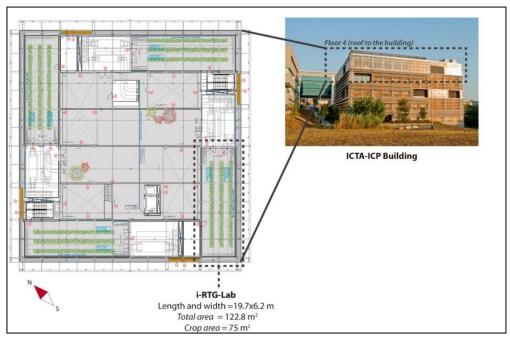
Layout of the rooftop of the ICTA-ICP building and the i-RTG.
